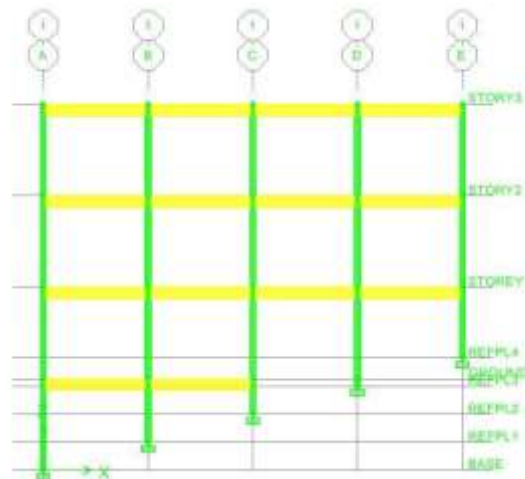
Elevation of step back building for three storey model (300 slope)
